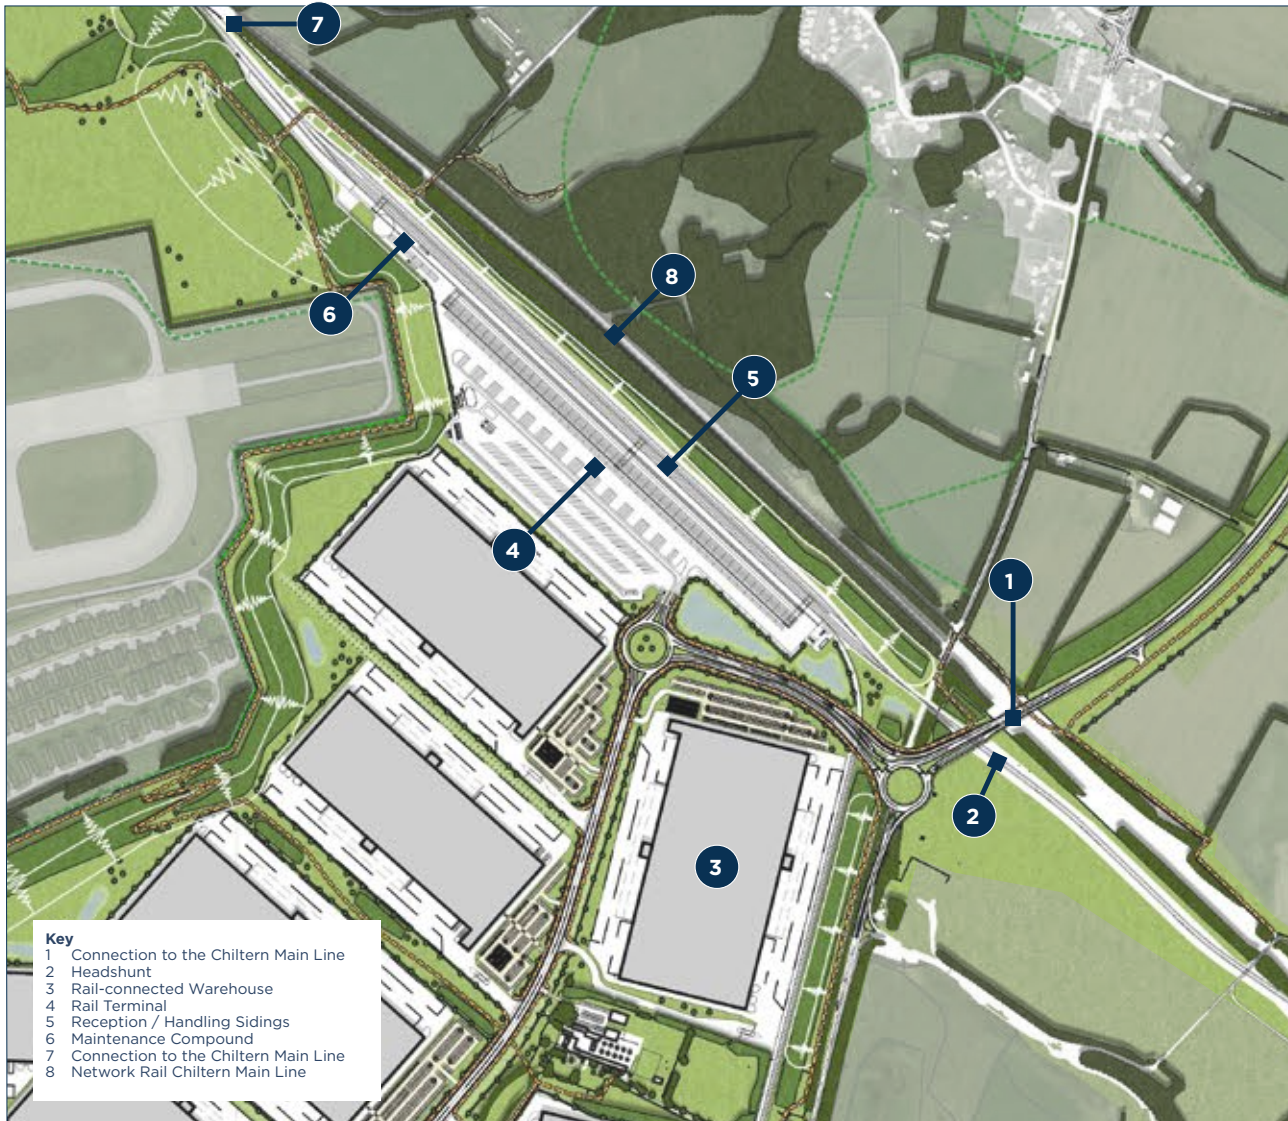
EXTRACT FROM ILLUSTRATIVE MASTERPLAN SHOWING PROPOSED RAIL TERMINAL
